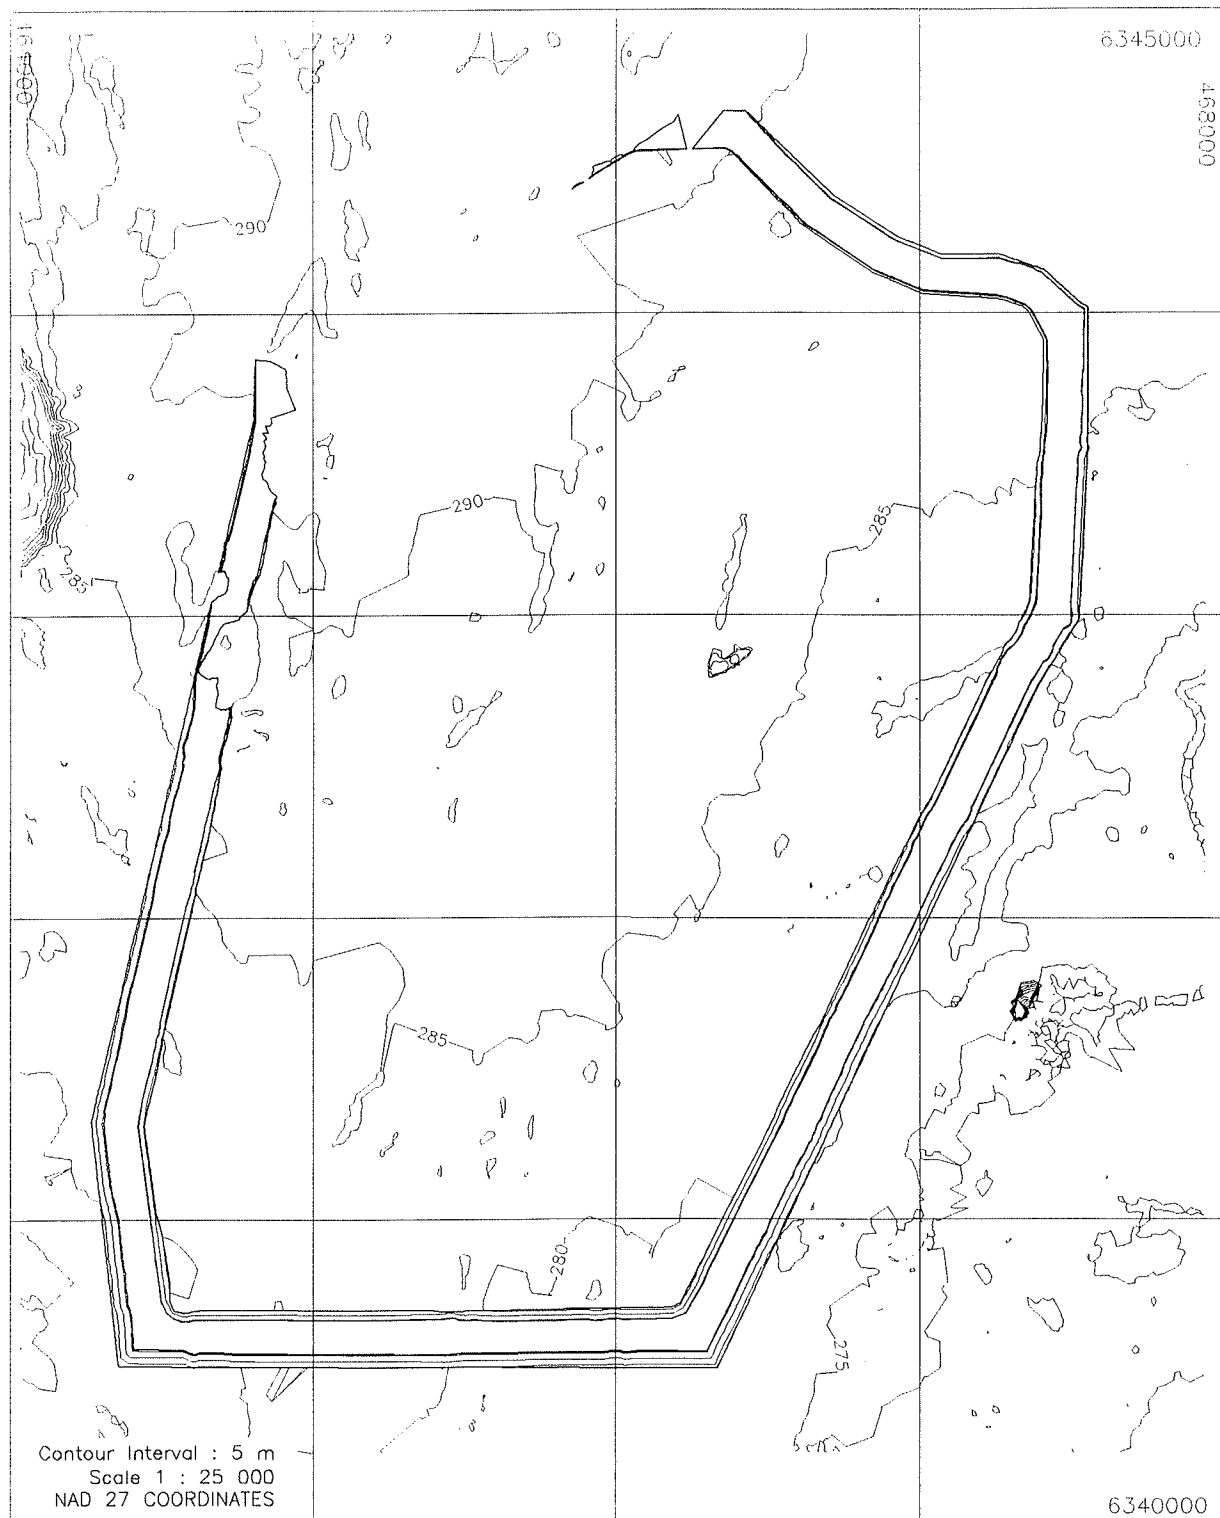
Outline of Tailings Settling Pond Overburden Starter Dyke
